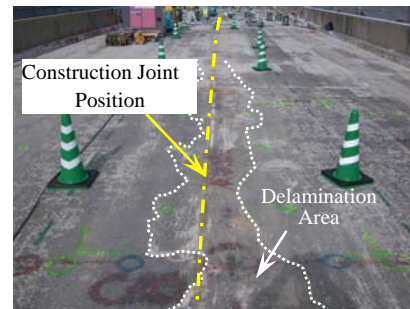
Upper slab surface (Under the ditch of the pavement) Figure 11. Upper slab surface (Under the construction joint of the pavement)
